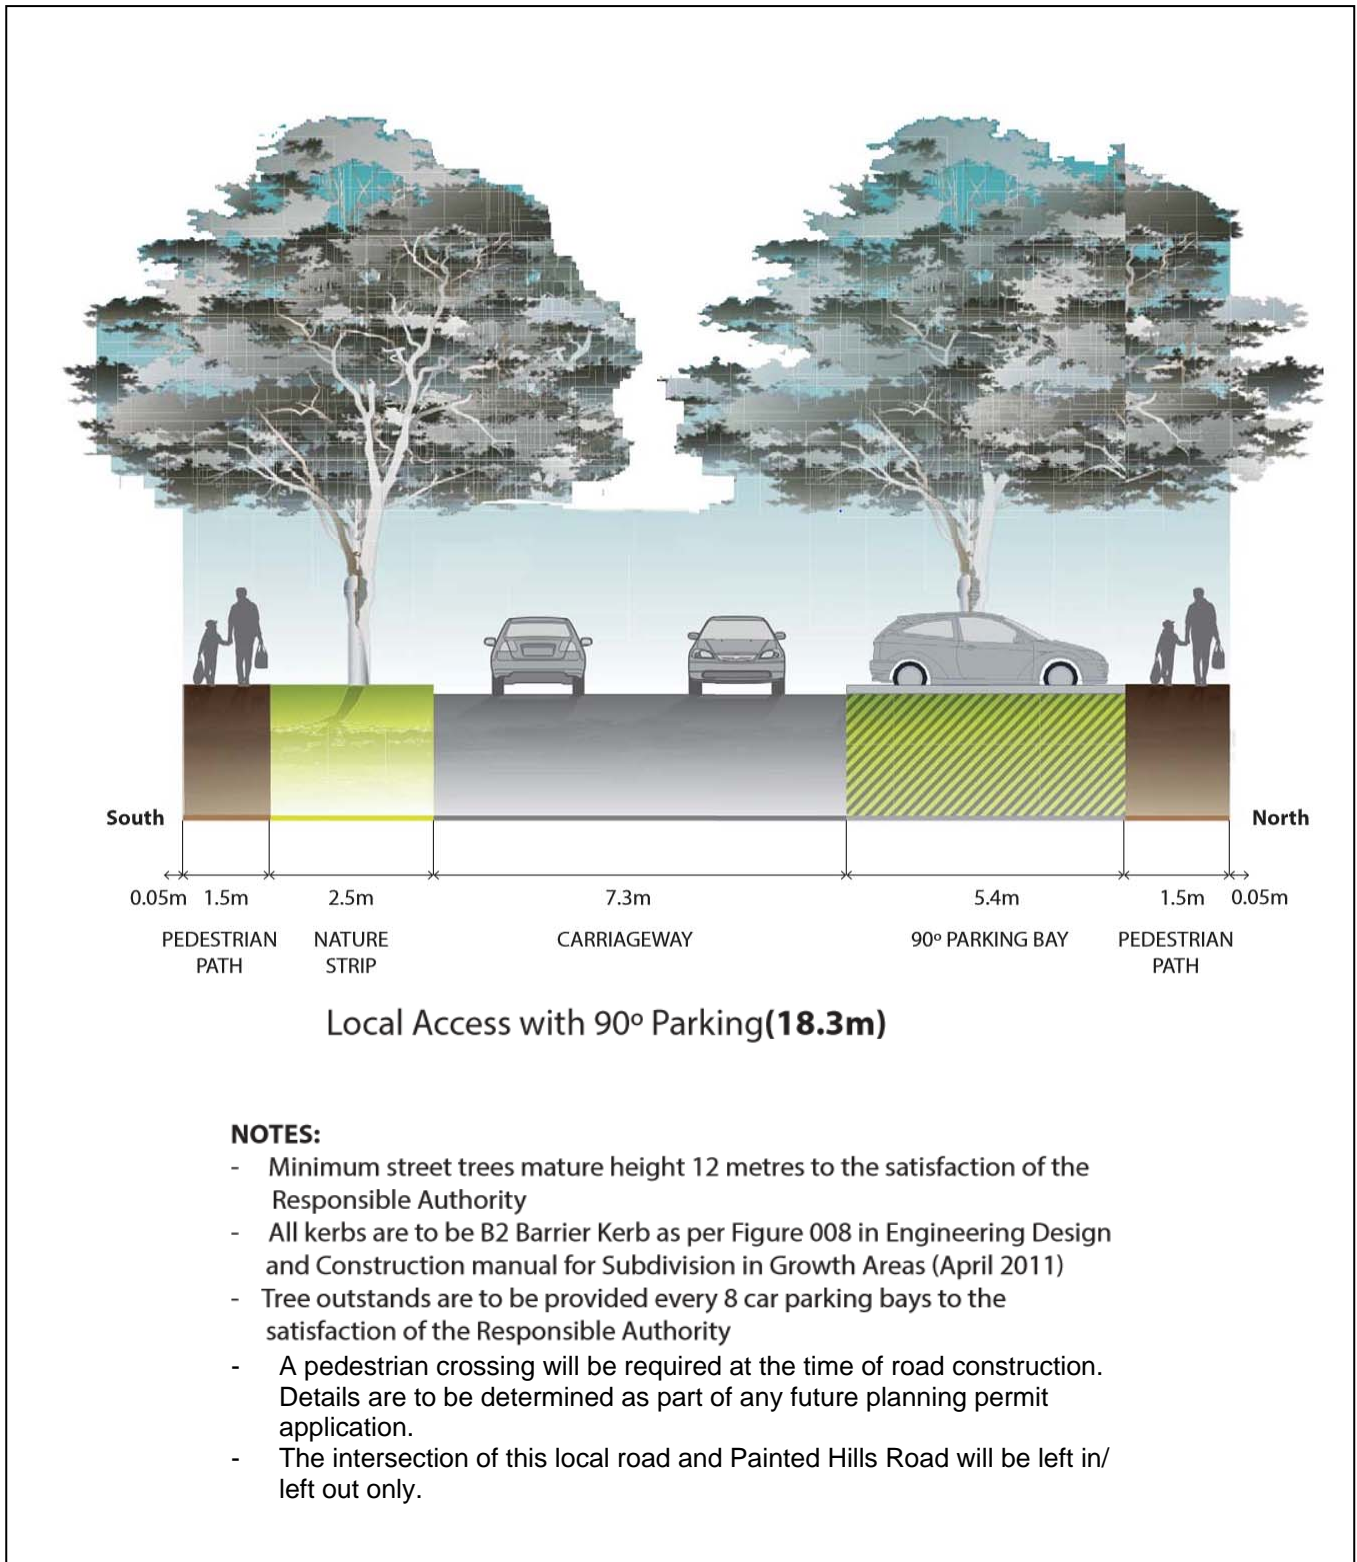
Example of Carriageway Cross Section Profile (Internal east-west road through Local Convenience Centre)
